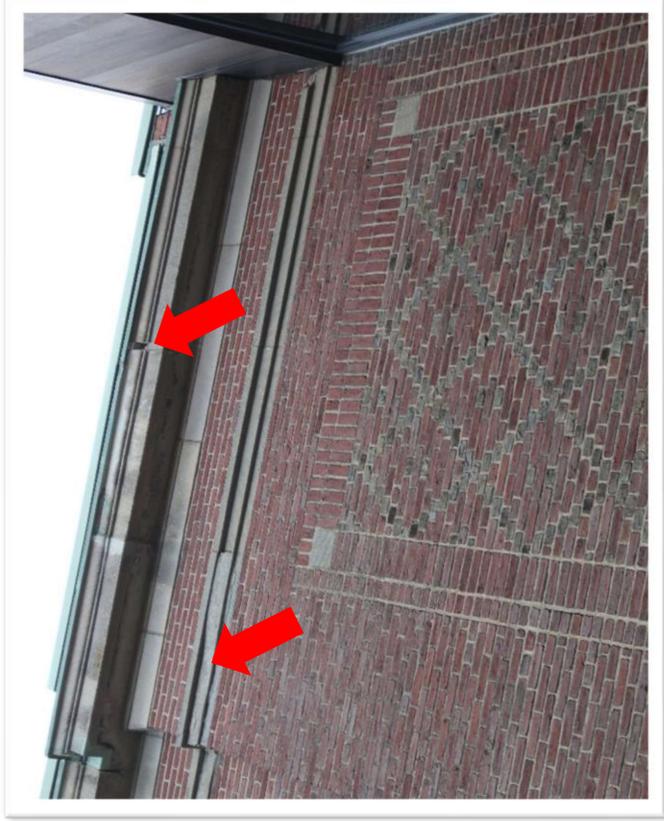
Random locations of deteriorated/defective precast observed along cornice/upper band.
